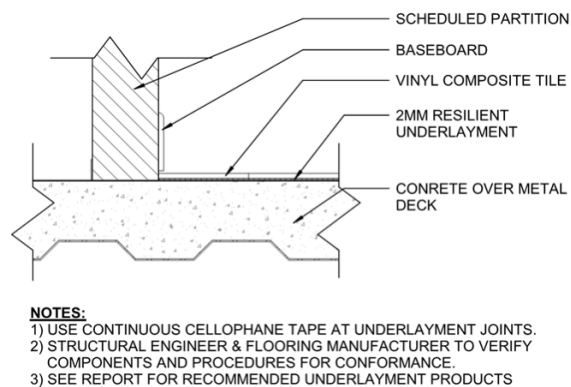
Floor Assembly with Vinyl Flooring and Underlayment
